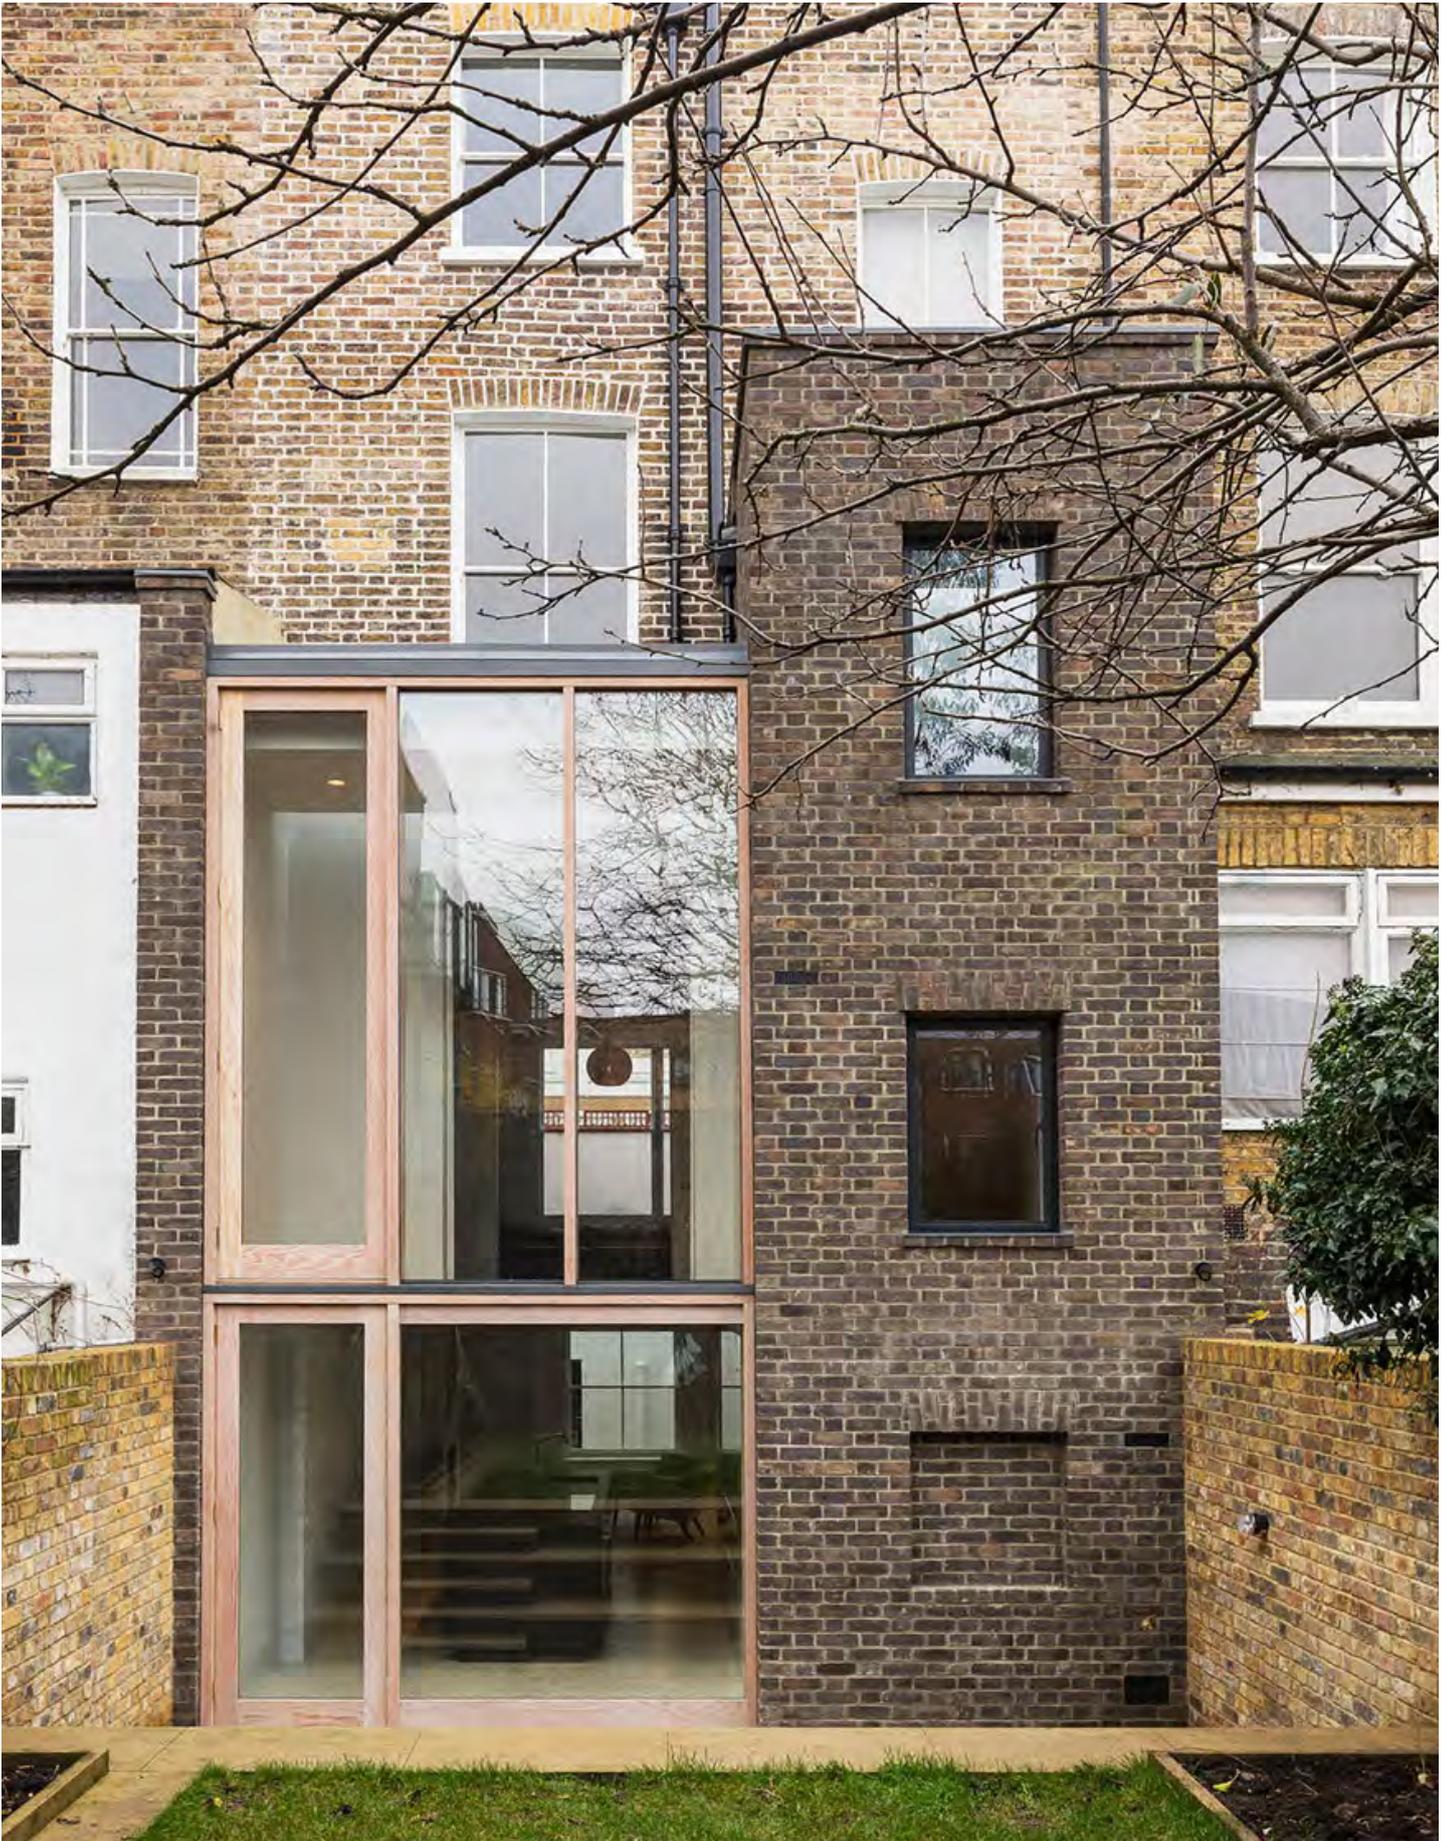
Example of a two-storey rear extension of a terraced house designed by Gundry+Ducker Arch. that infills between existing extensions and outriggers, refer to Section 4.16 for guidance. This scheme also features a well-designed parapet detail to the roof (refer to Section 4.15) and concealed rainwater goods (refer to Section 2.24) giving a clean appearance. (Photo: Andrew Meredith)
